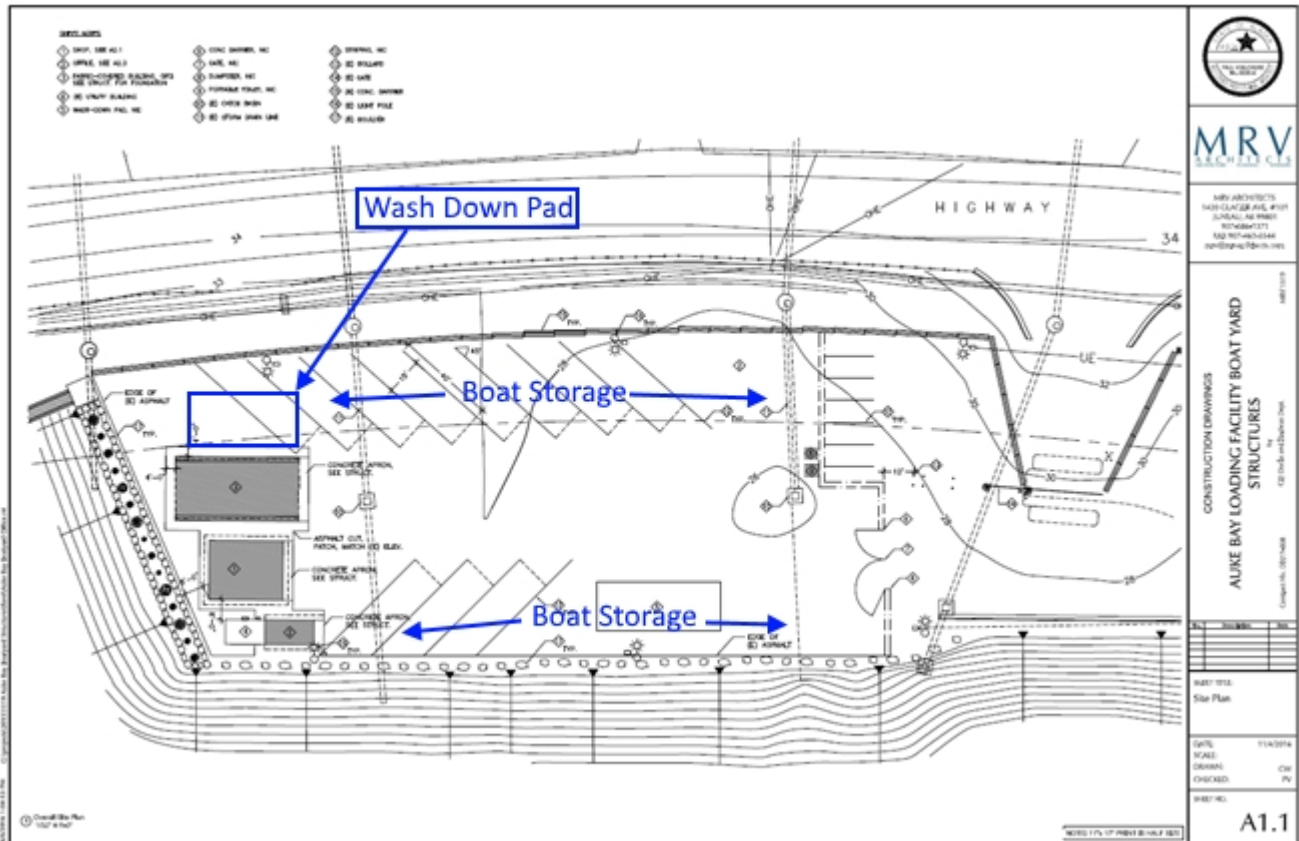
Approximate site layout from architectural site plan, blue modifications by appraiser, based on notes taken during May 15, 2018 inspection
